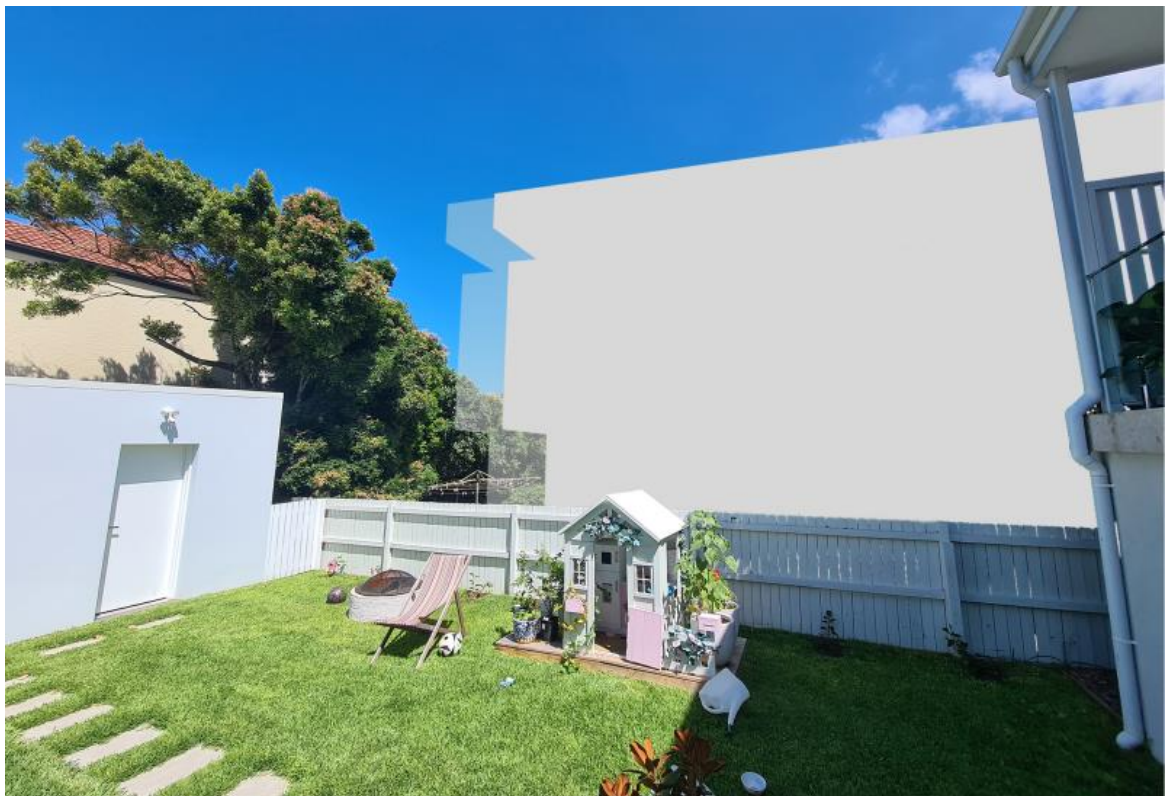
Rear Garden view including montage of proposed development– facing South (Source: Applicant's photomontage)
